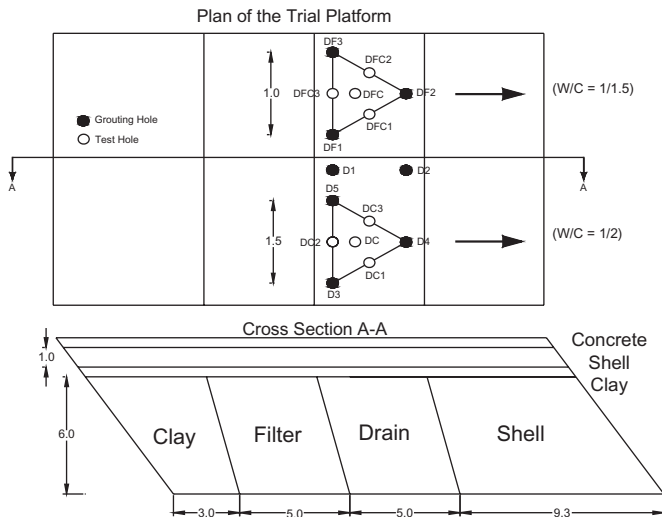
Plan and a cross section of the trial platform for grouting of drain. Dimensions are in meters.
